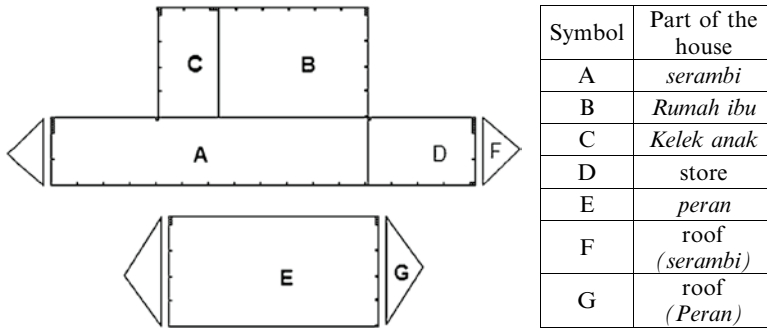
Floor plan of *Rumah Negeri Sembilan
